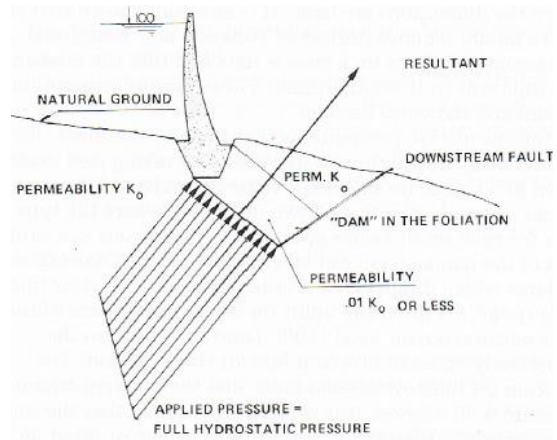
Failure of the Malpasset Dam (Goodman, 2013)
